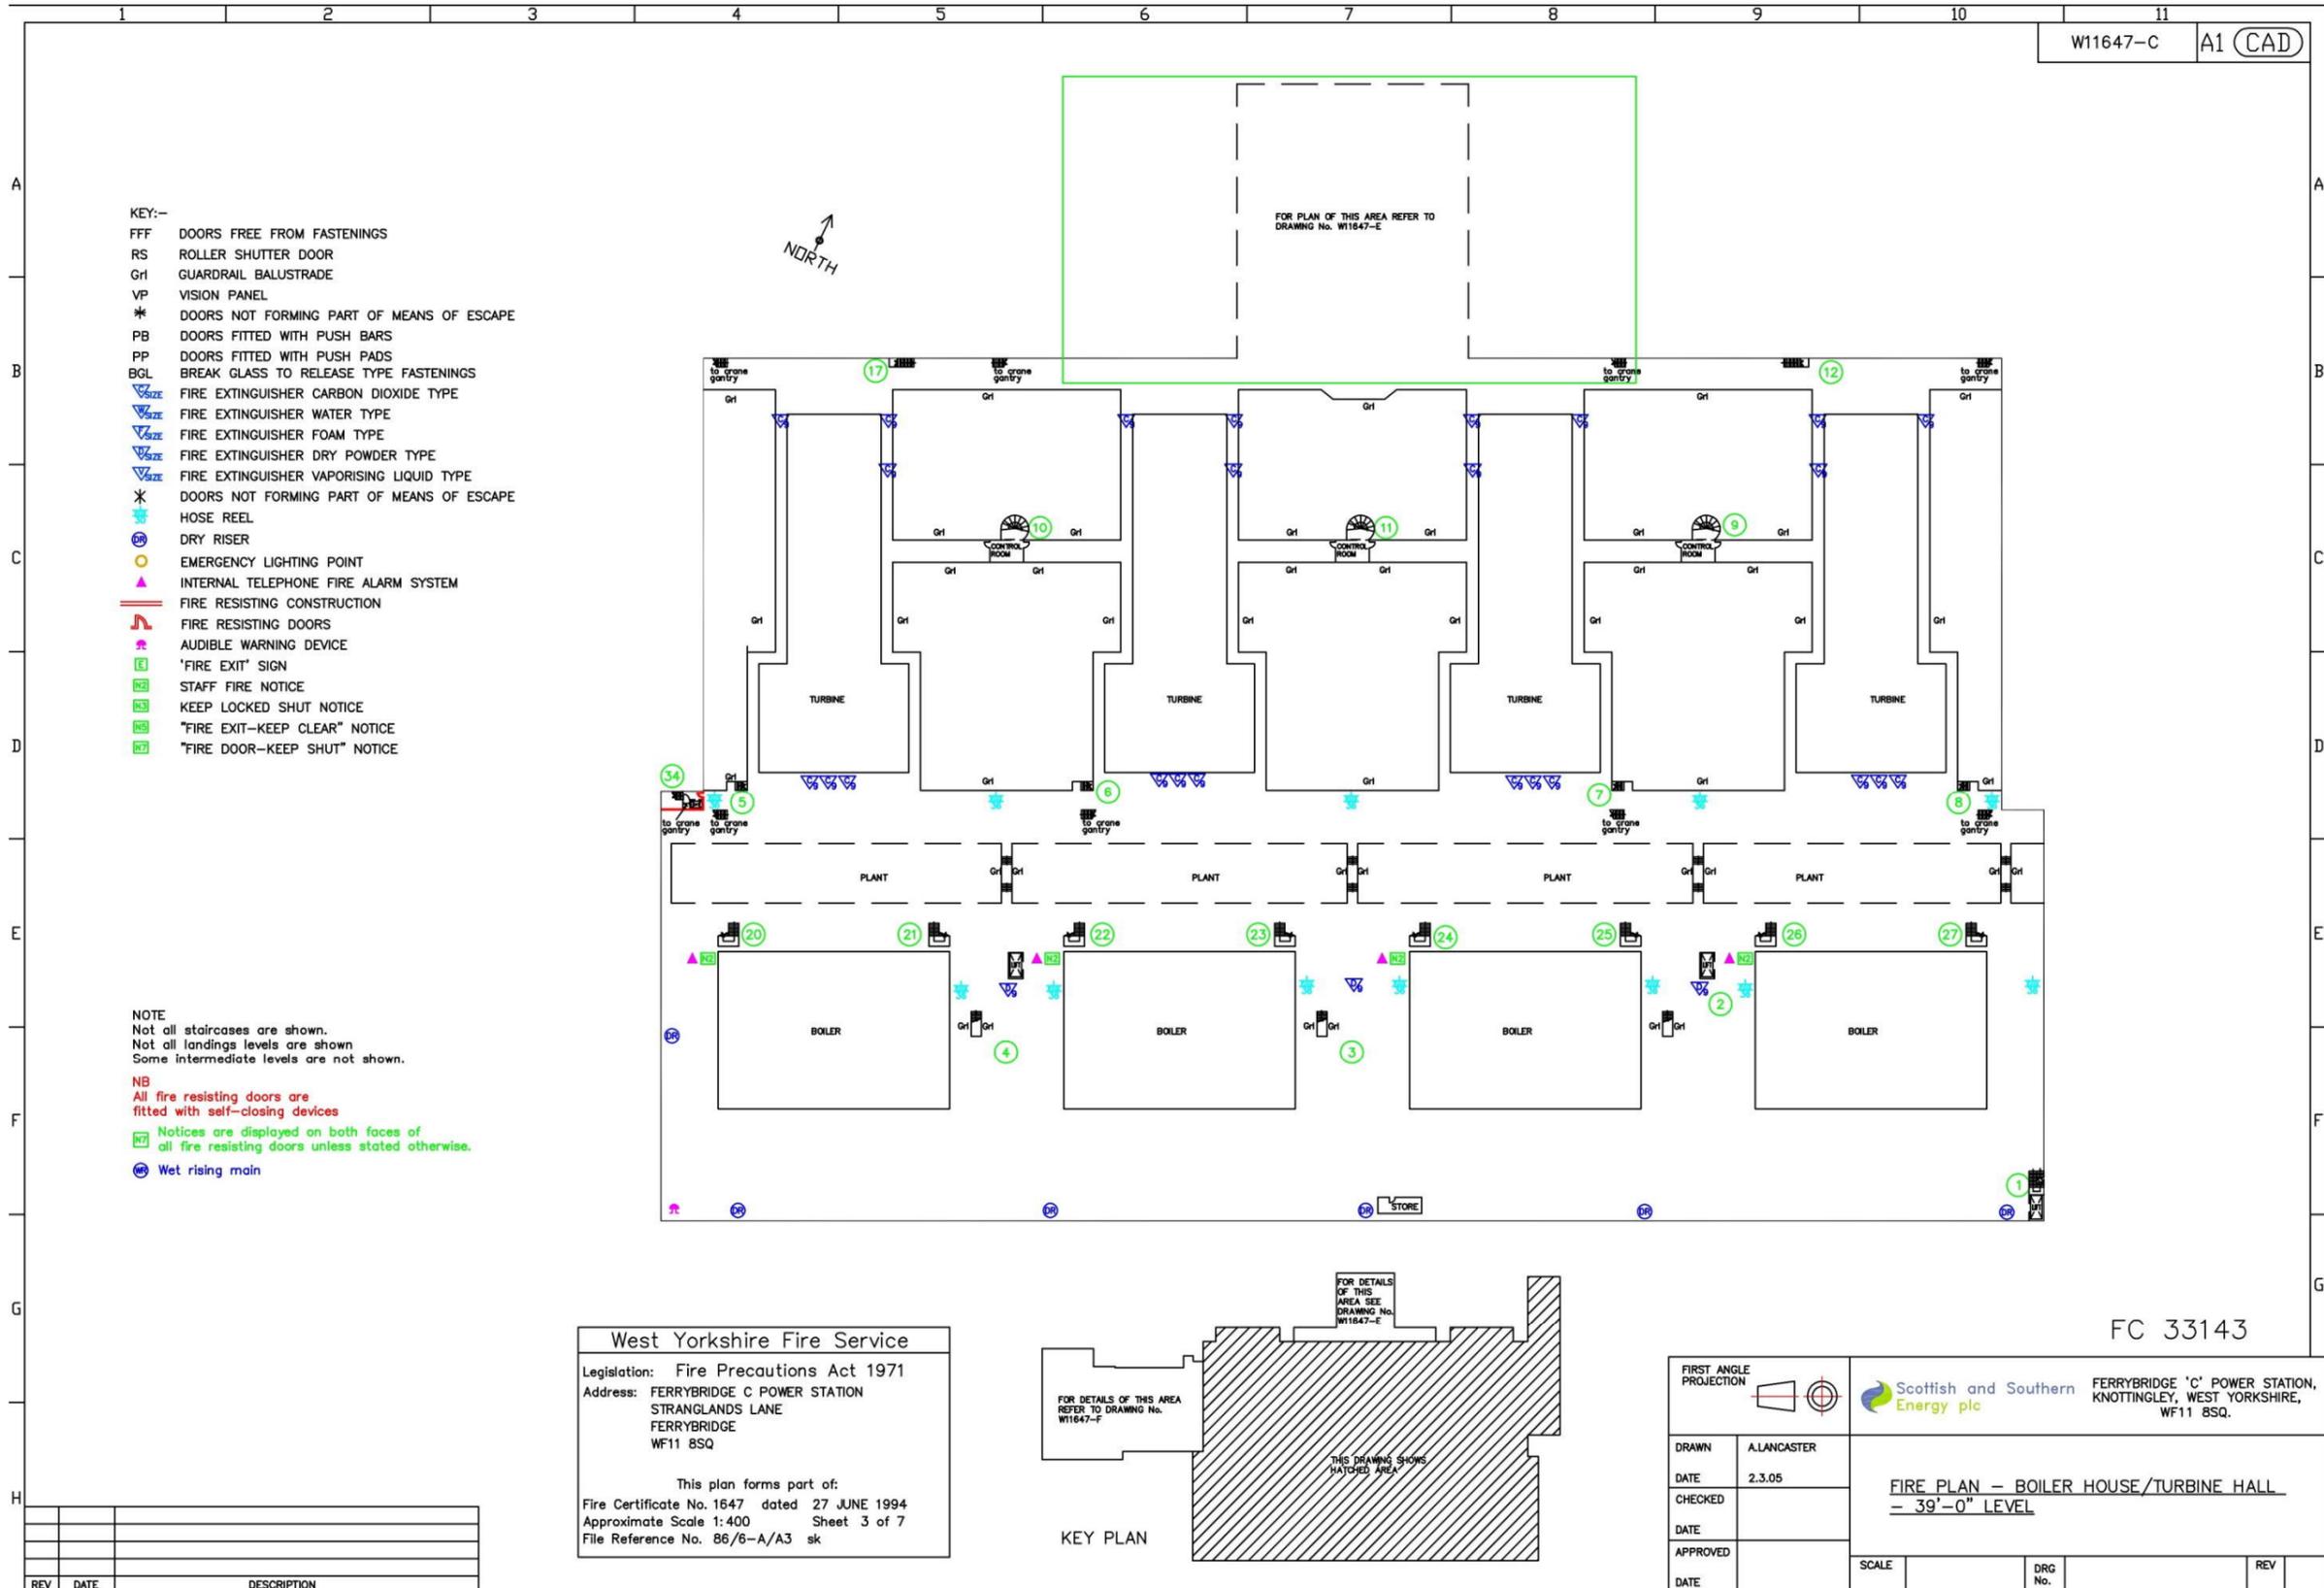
Plan of the 39" floor of the main station buildings, showing the Mill Bay, Boiler House and Turbine Hall.
